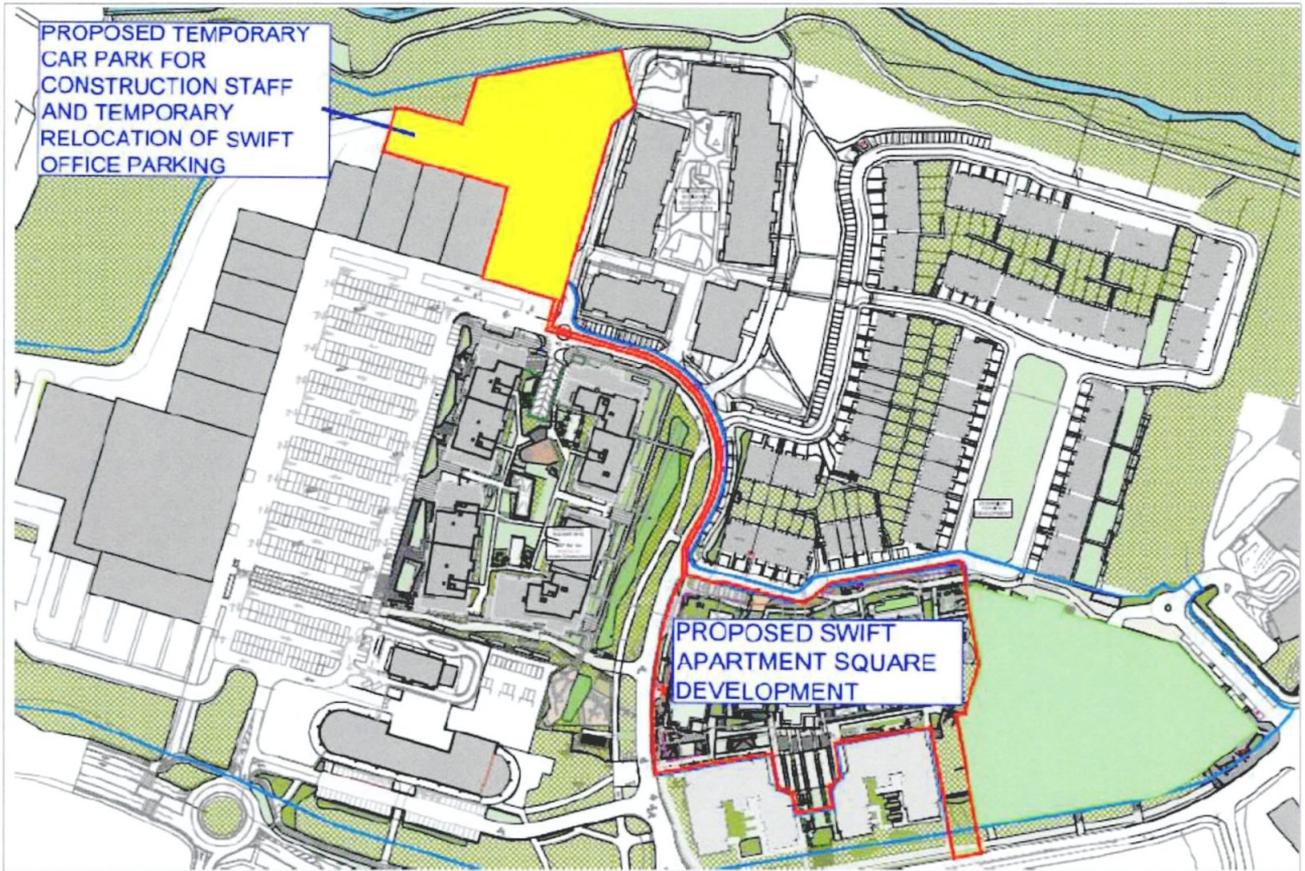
Proposed Location for Temporary Car Parking for Swift Square Office Park Personnel and Construction Staff (indicative subject Site outline in red)
